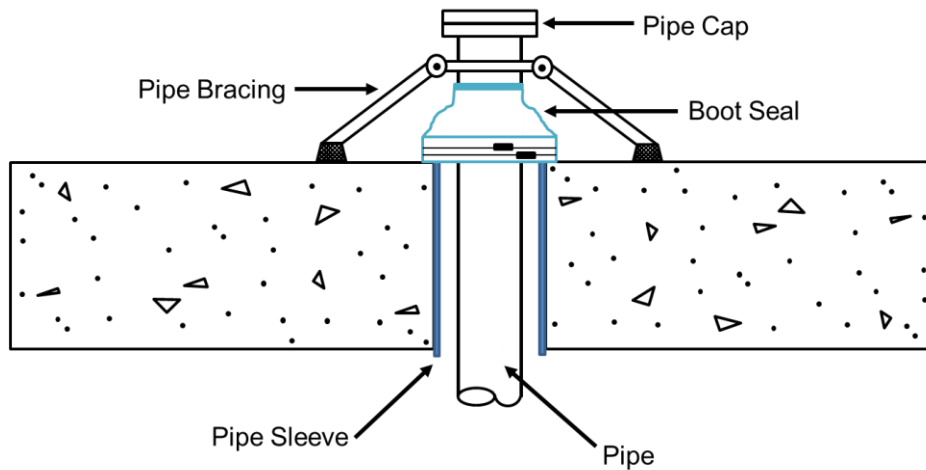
Test Deck Cross Section with Braced Pipe Penetrant
